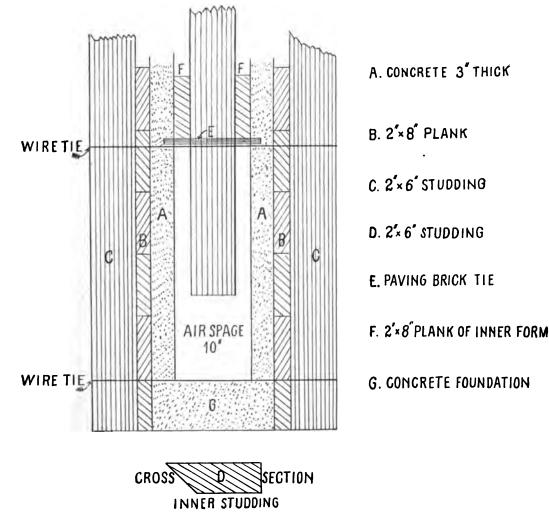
BUILDING CONCRETE HOUSE WALLS.
